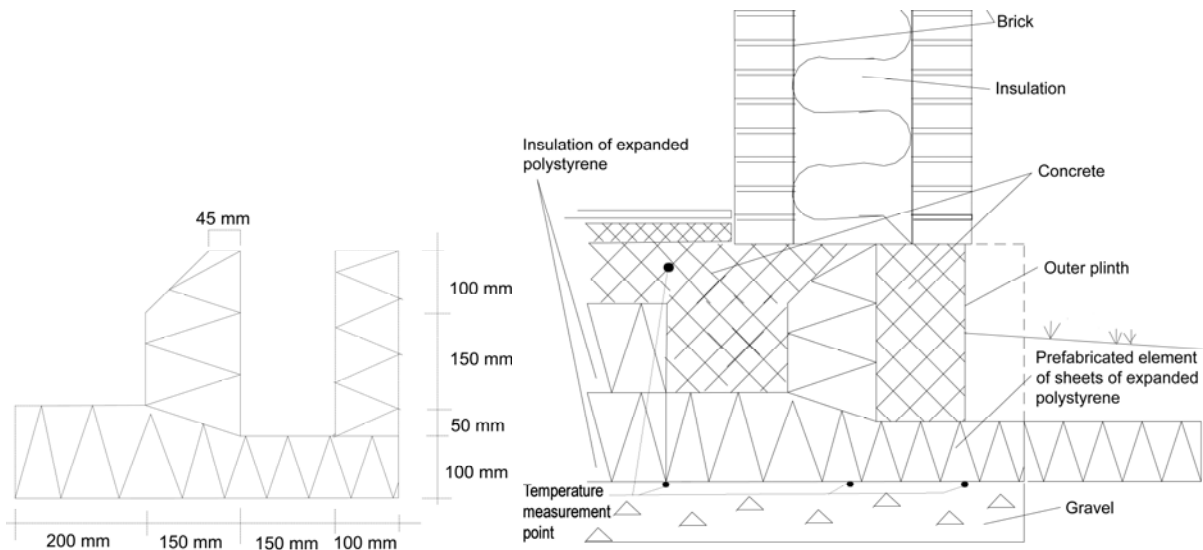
a): left, the prefabricated element made of EPS, b):right, the EPS element used as the strip foundation of a traditional double brick wall separated by mineral-based insulation.
